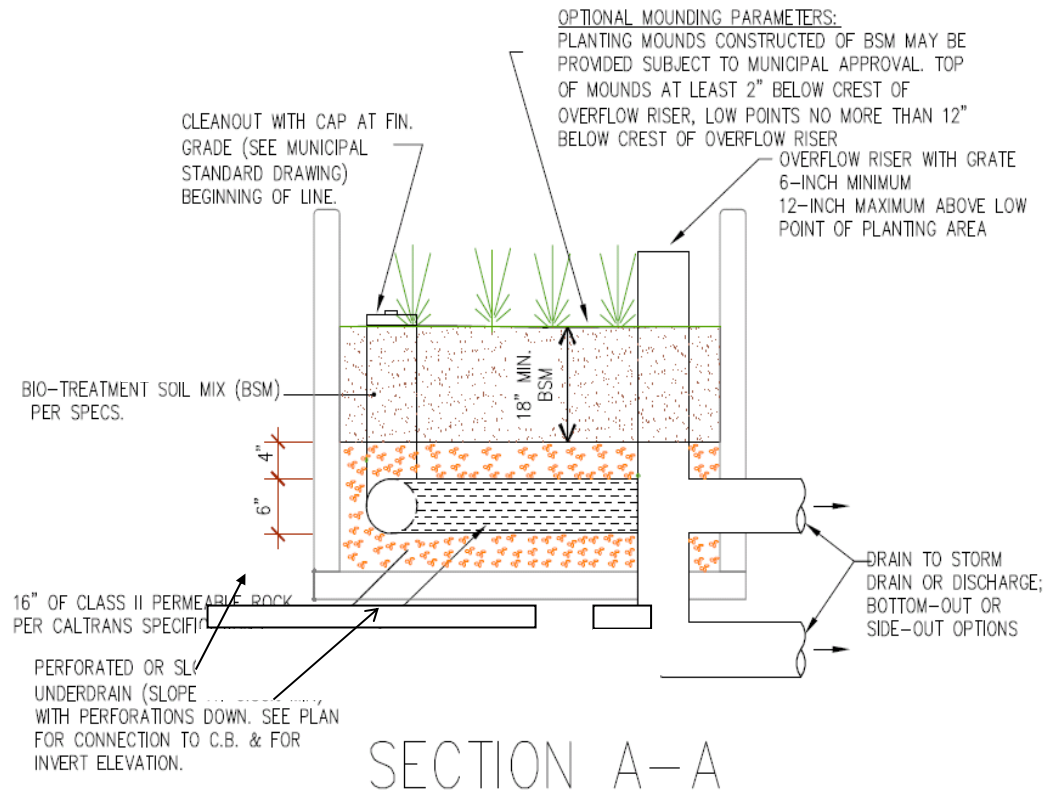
Cross section A-A of flow-through planter, shows side view of underdrain
